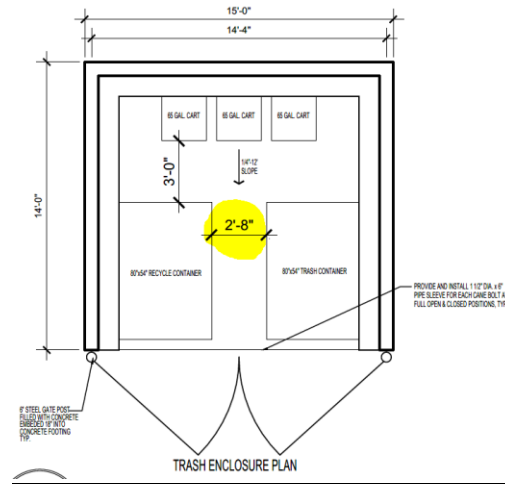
Space between the two recycle containers must be a minimum 4 feet.
